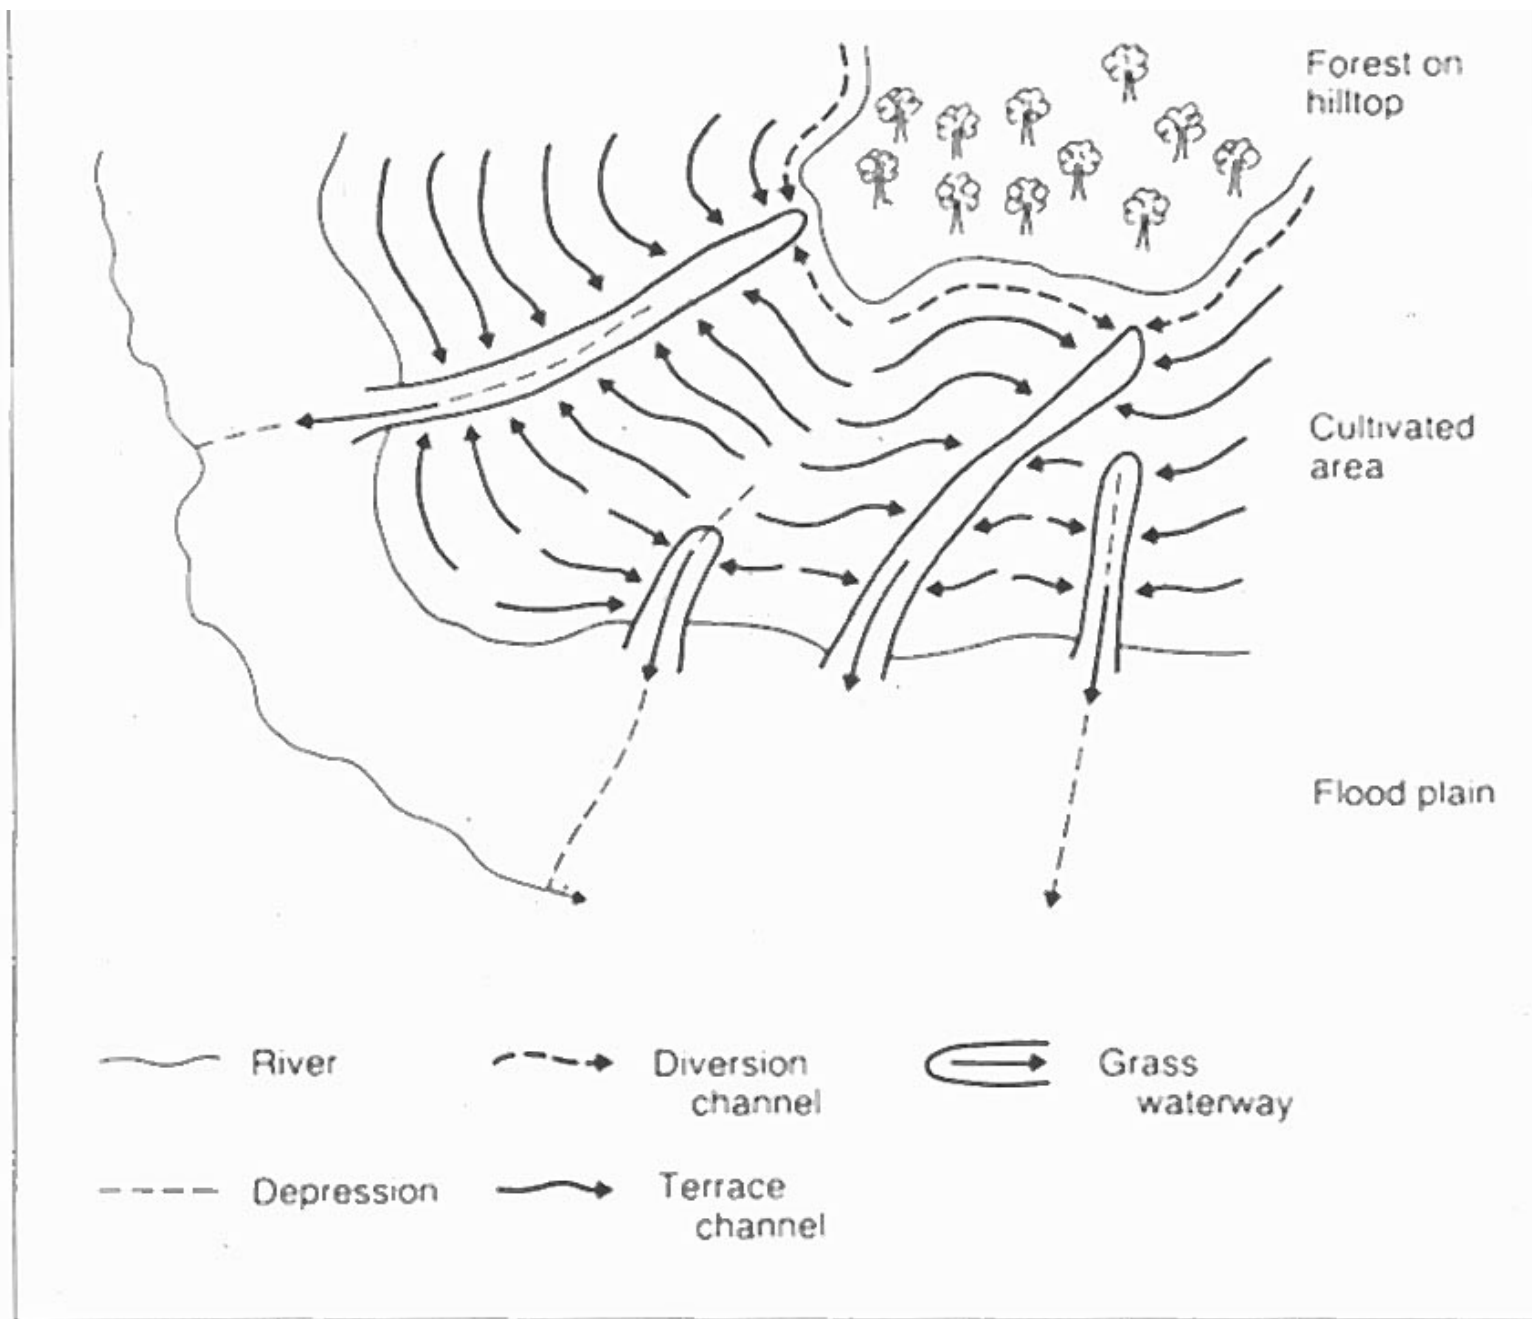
Typical layout of waterways in a soil conservation scheme
